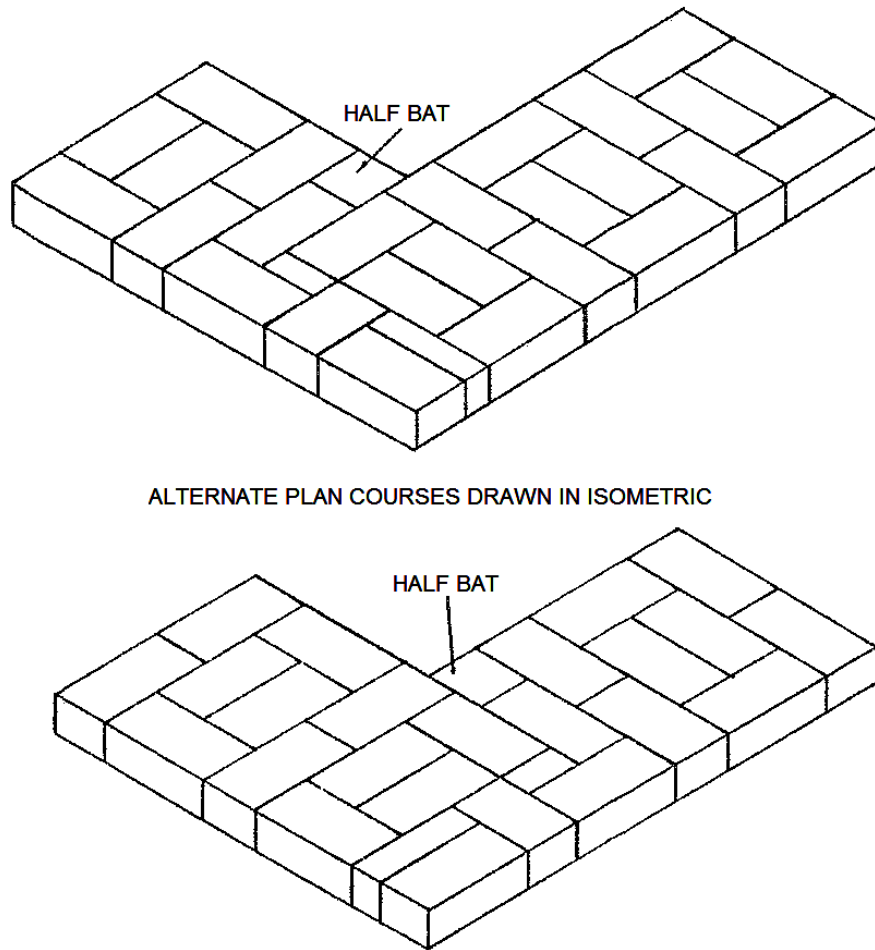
The alternate plan courses of a double Flemish bond quoin in two-brick walling. The drawing is done in isometric projection.
